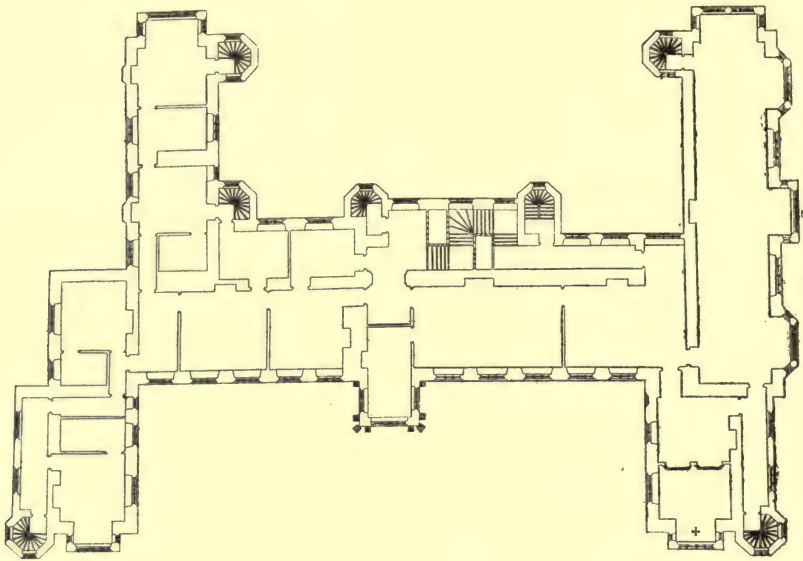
Fig. II. SIR ROBERT CECIL'S PLAN FOR THE REBUILDING OF CHELSEA HOUSE (C. 1590). FIRST FLOOR.
